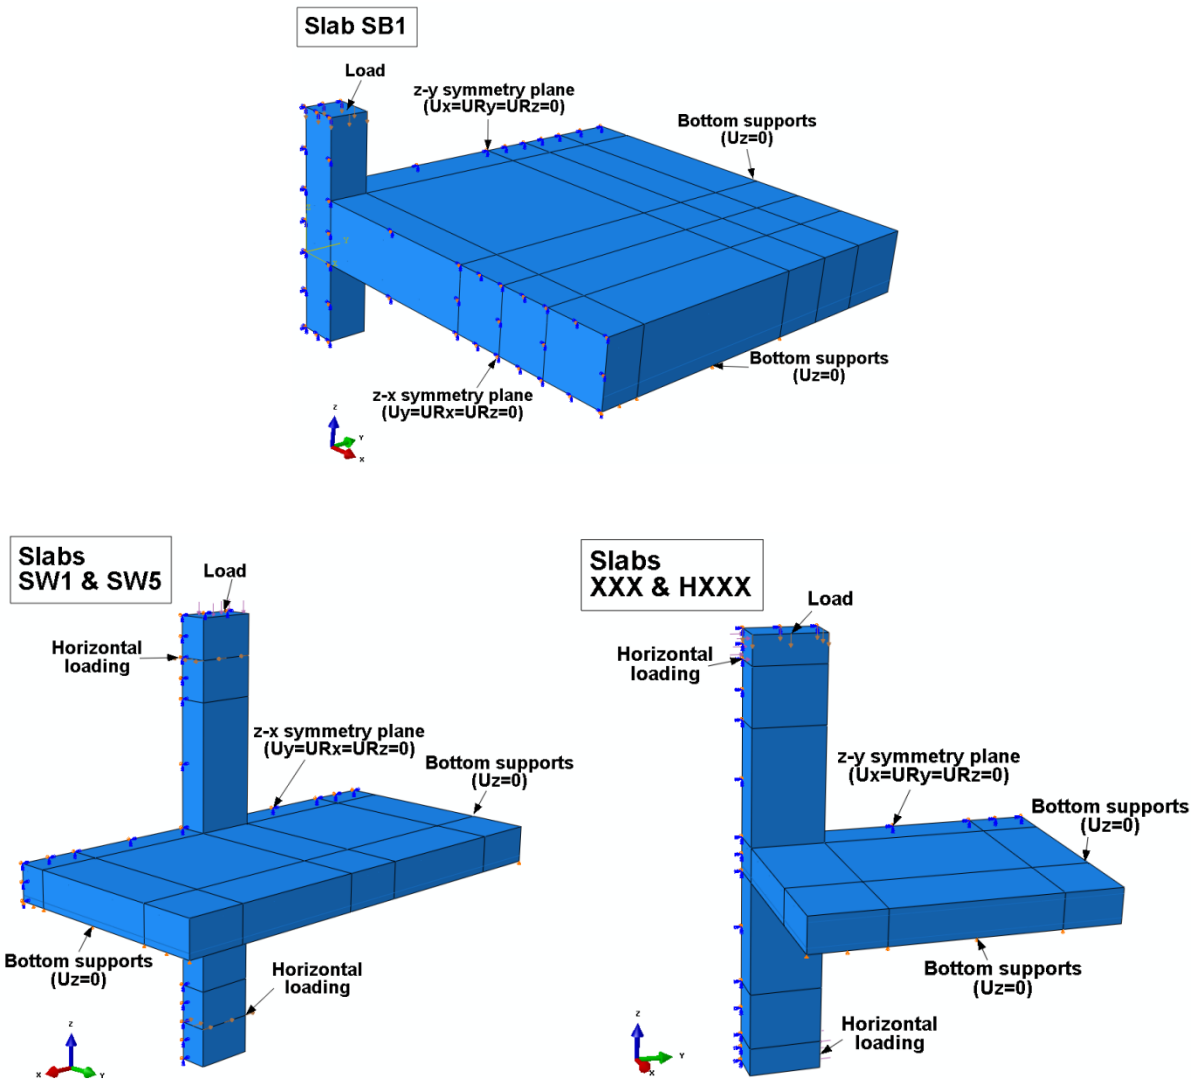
Schematic drawings of the specimens - dimensions & loading.
